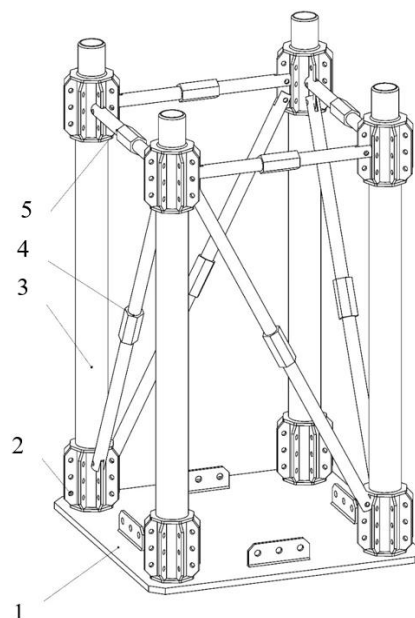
Construction of the support part of the column: 1 – support plate (header under the column); 2 – clutch; 3 – column section; 4 – diagonal ties; 5 – transverse ties
